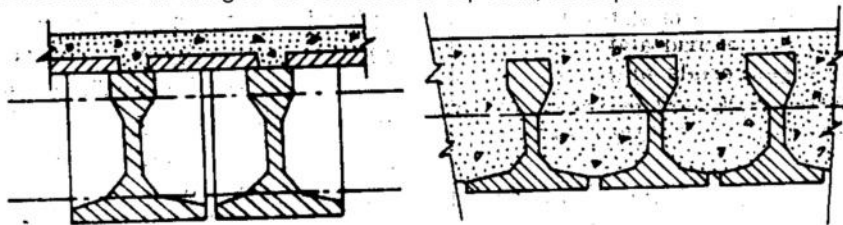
Schematic Cross Section of Composite Slab Decks
